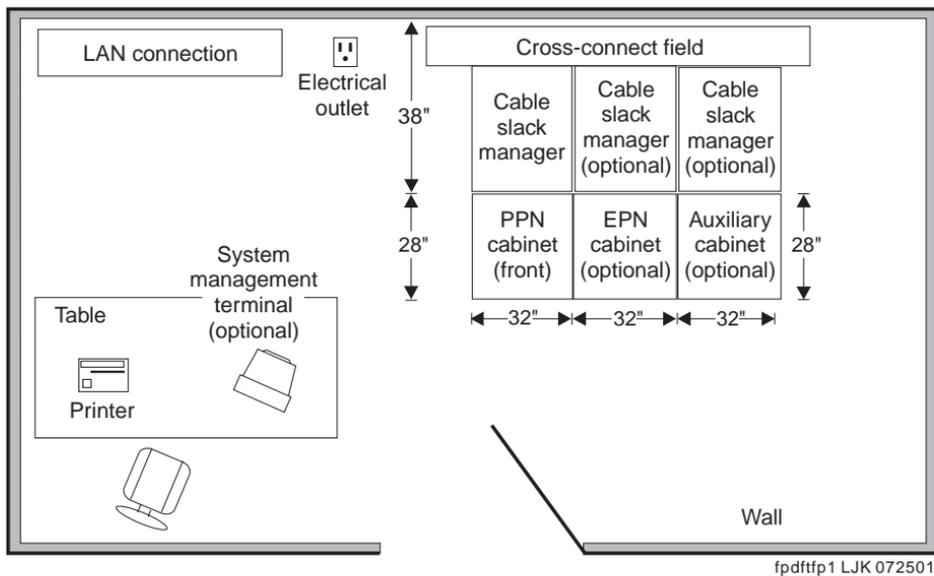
Typical Floor Plan with EPN and Auxiliary Cabinet
